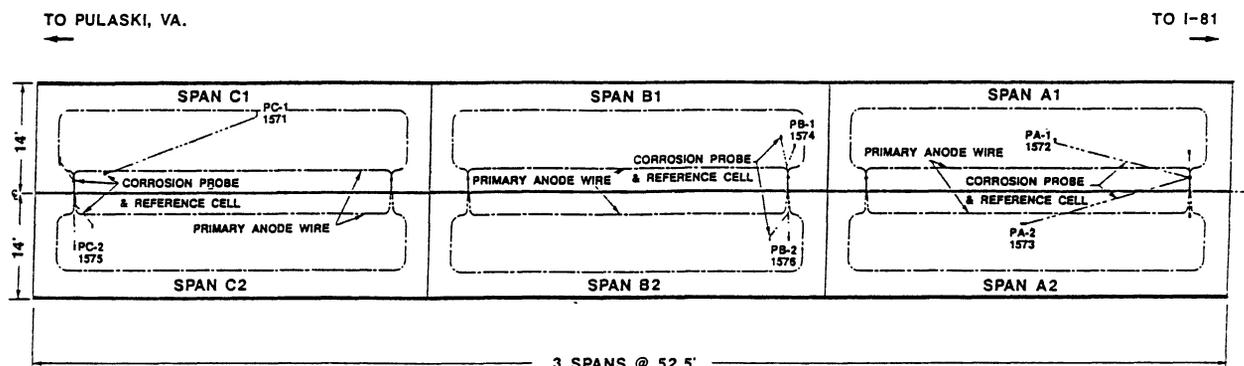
Bridge deck span layout for installations 5, 6, and 7 showing the locations of the conductive loops, reference cells, and corrosion rate probes in each of six zones (two zones per span).
